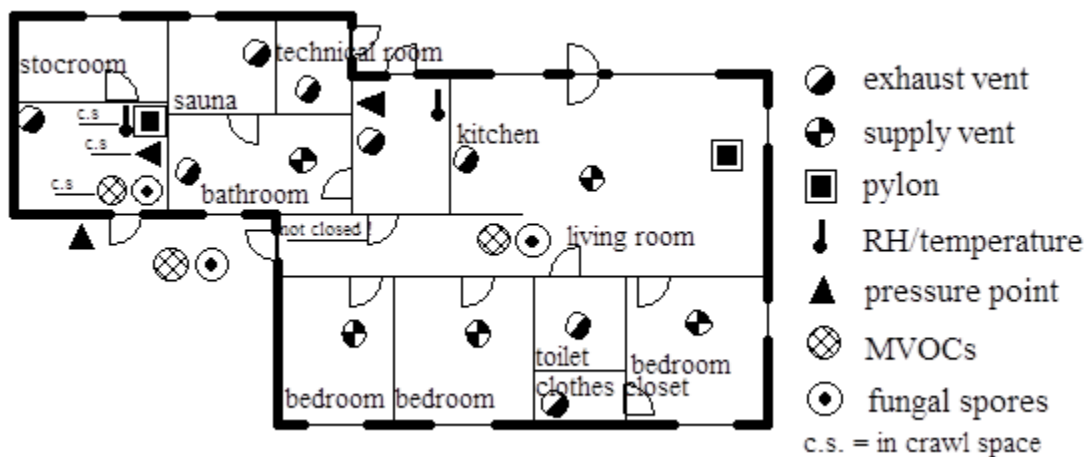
Floor plan and sampling points of the crawl space in the studied building.
